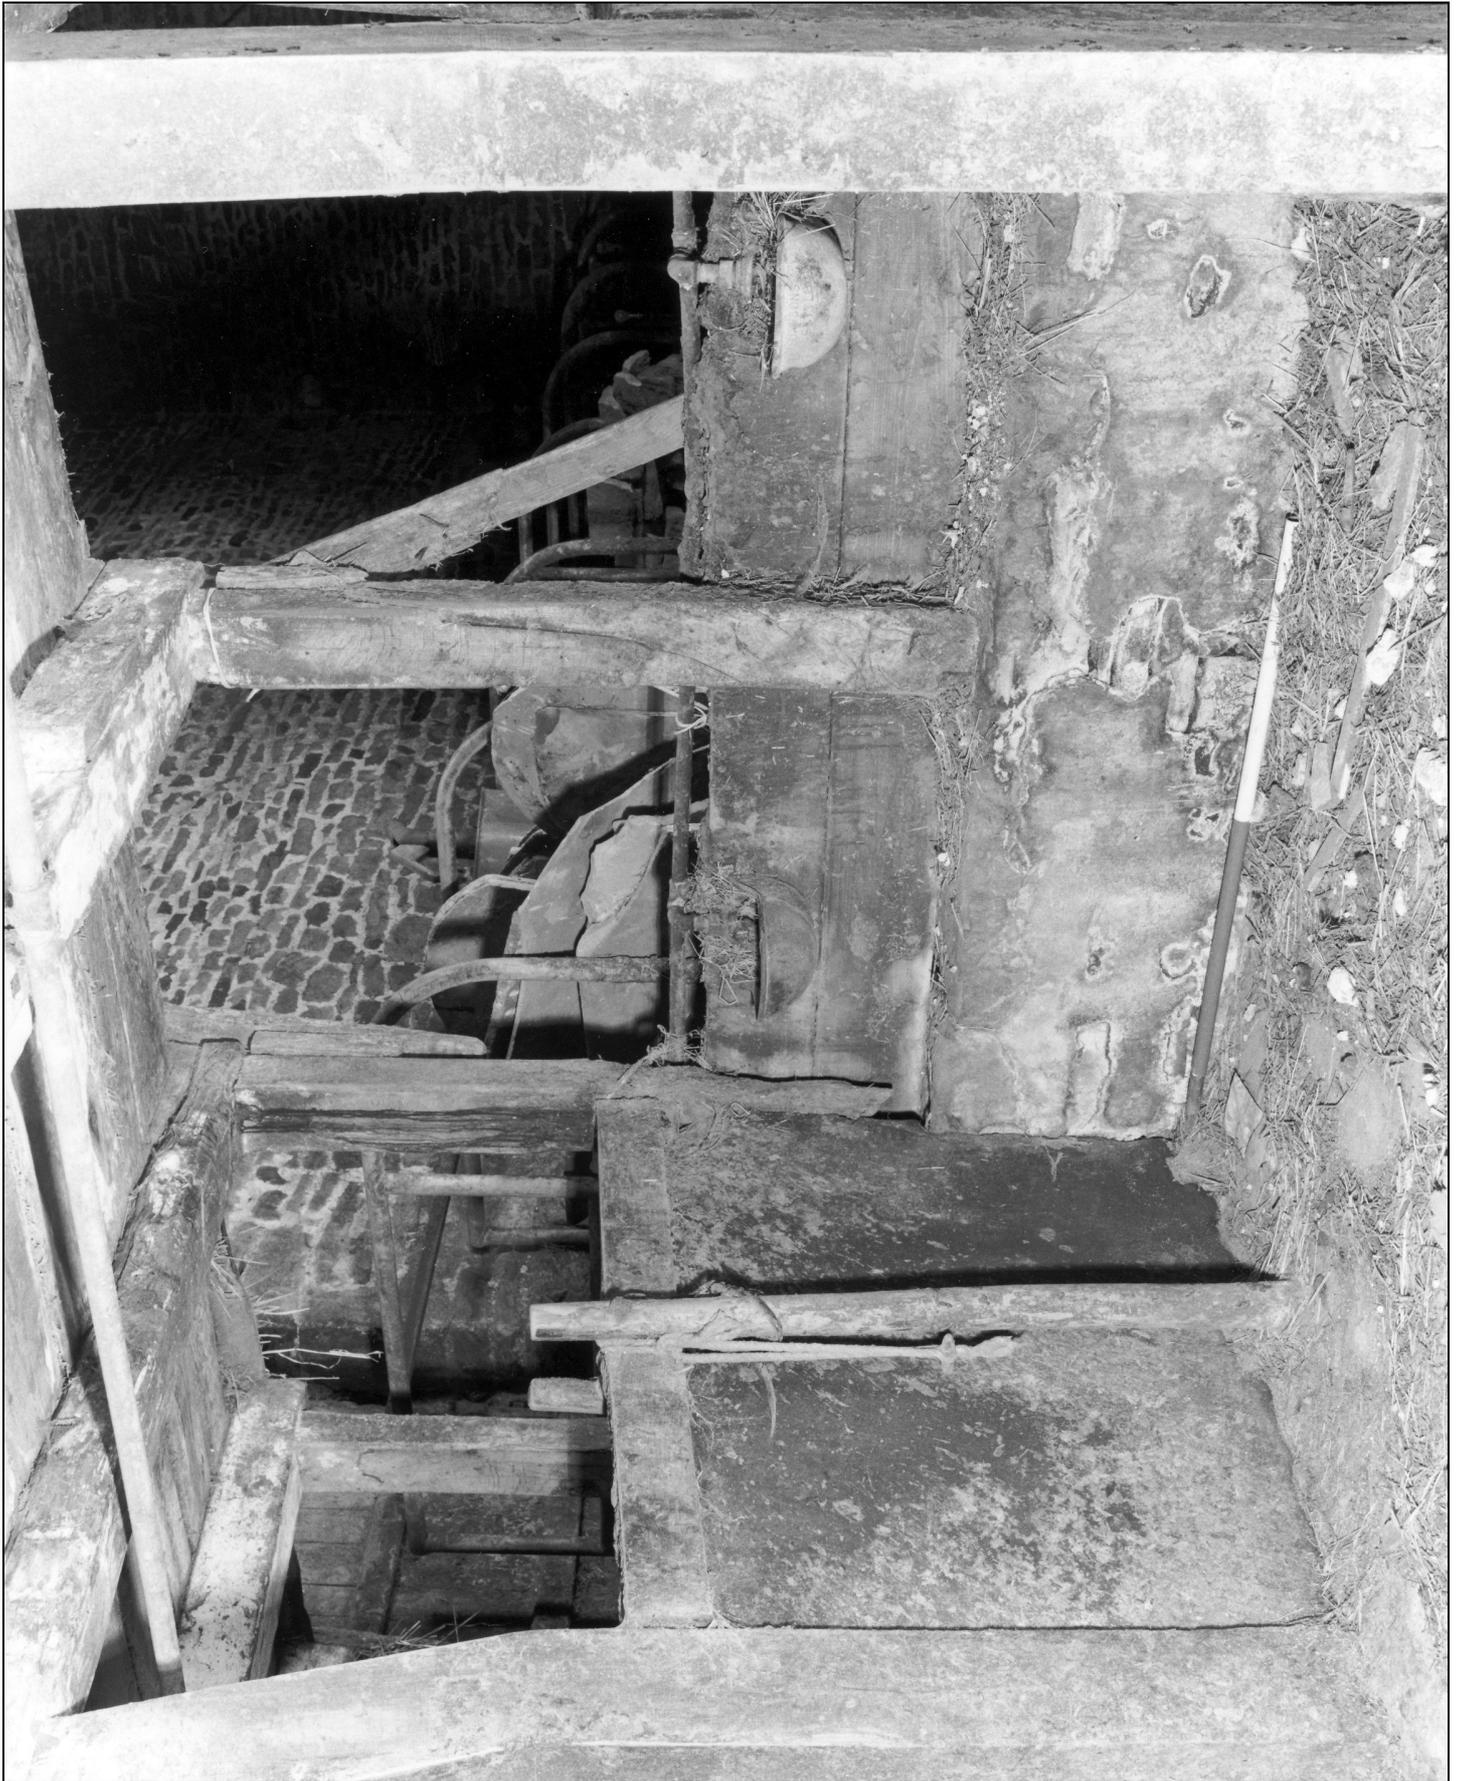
Detail of stalls and boskin in shippon, from the south-west
